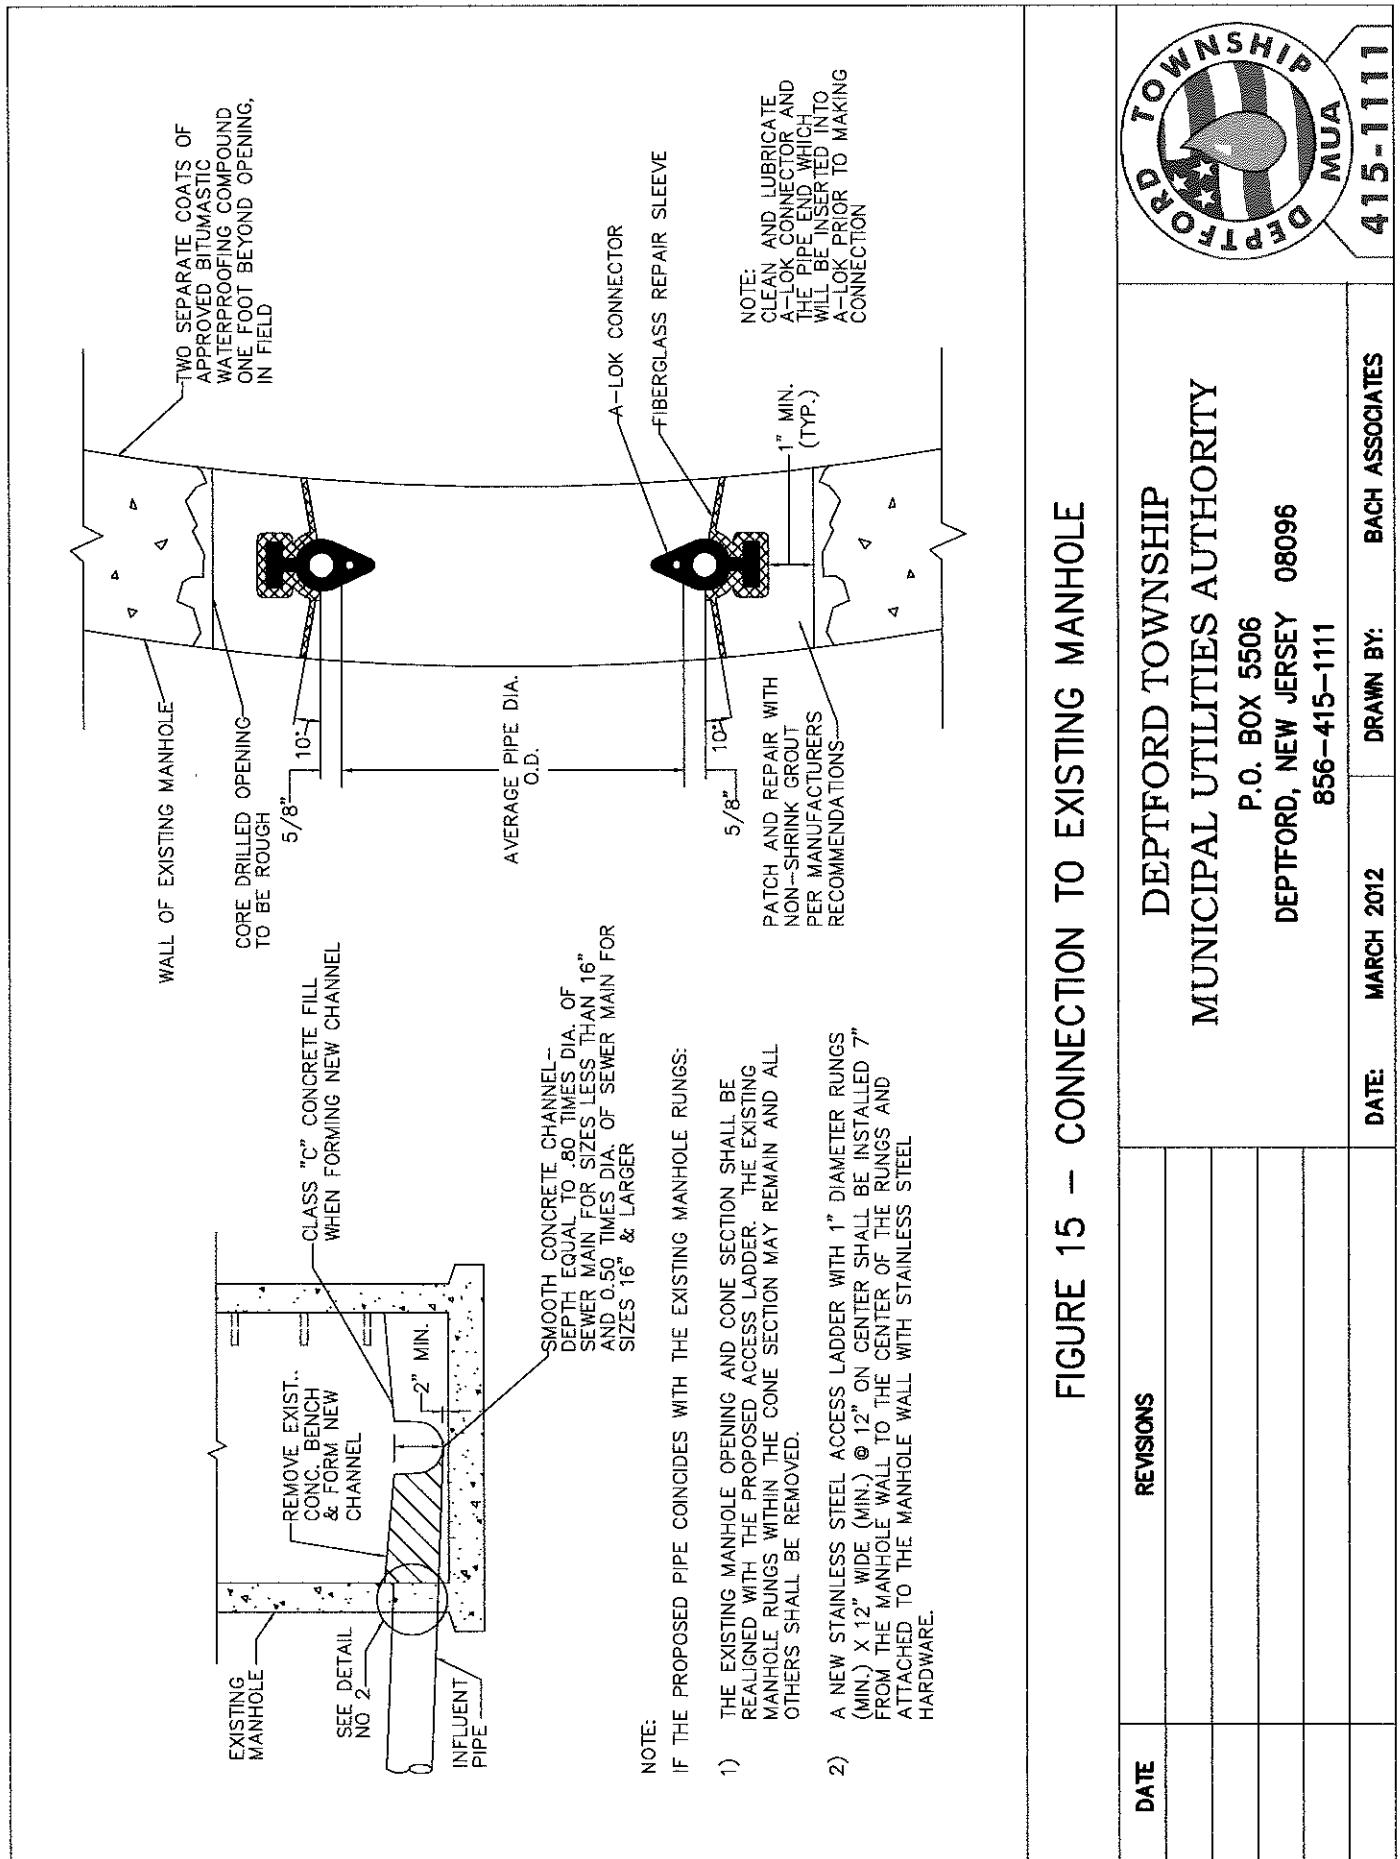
CONNECTION TO EXISTING MANHOLE
